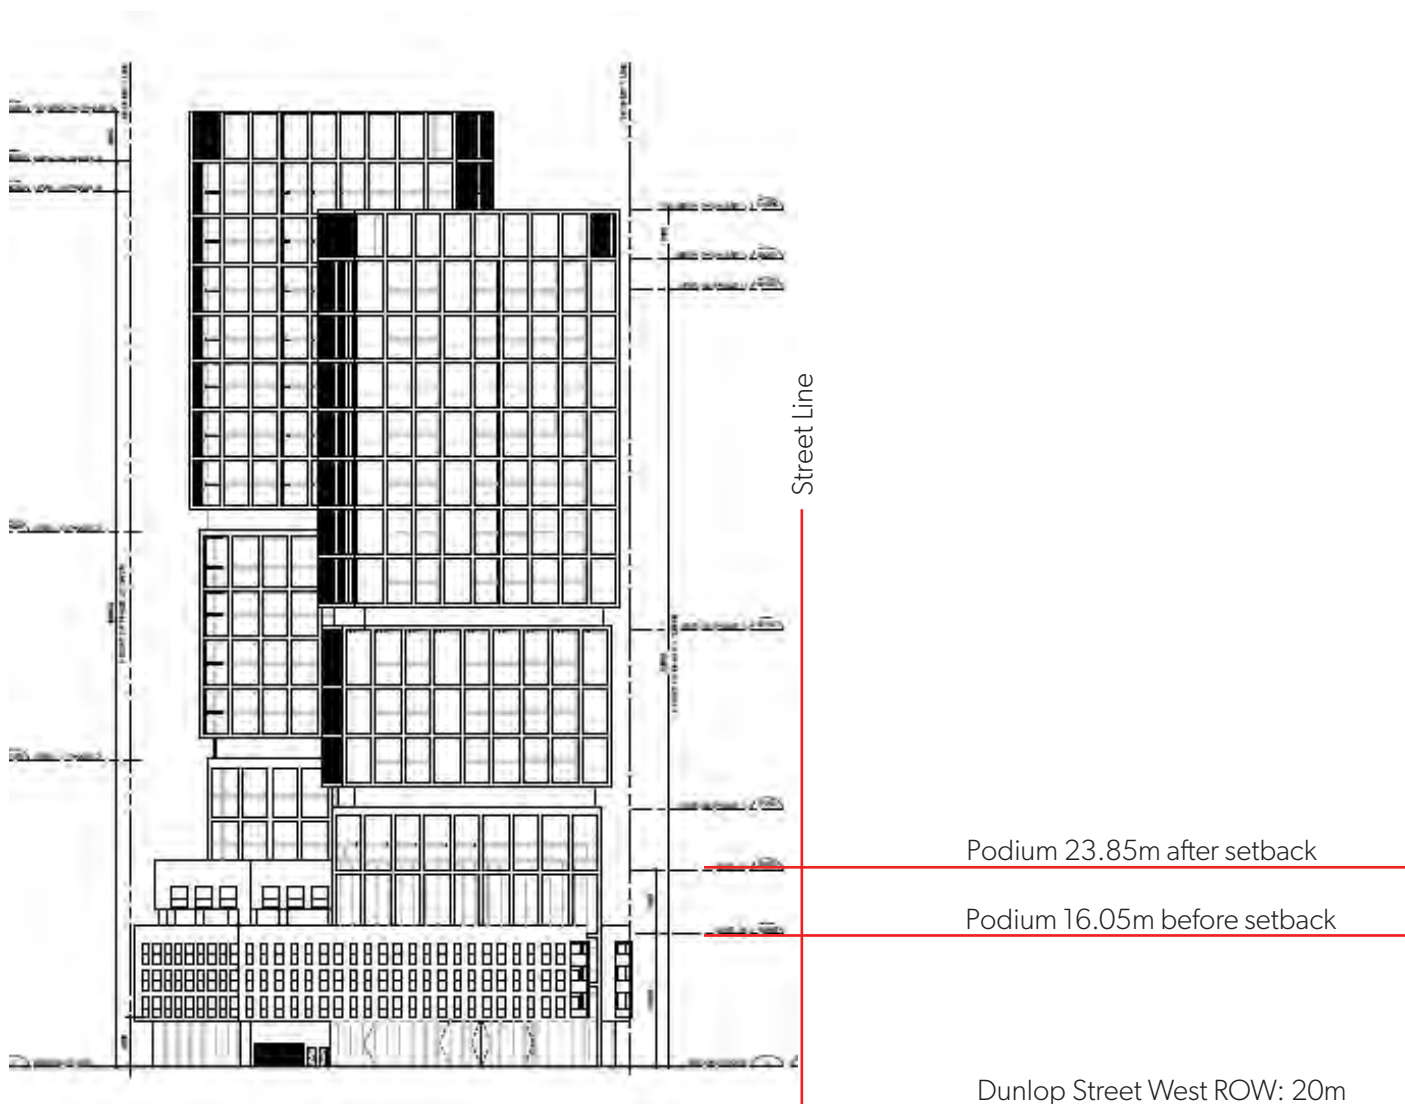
Cross-section of East Elevation illustrating building in relation to Dunlop Street West
